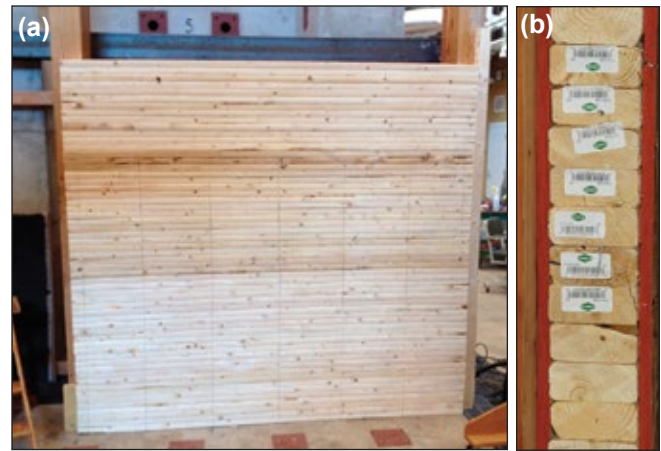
Stacked 2 × 4 wall design. (a) Stacked and nailed 2 × 4s prior to attachment of wood sheathing. (b) Side view of wall before testing.
